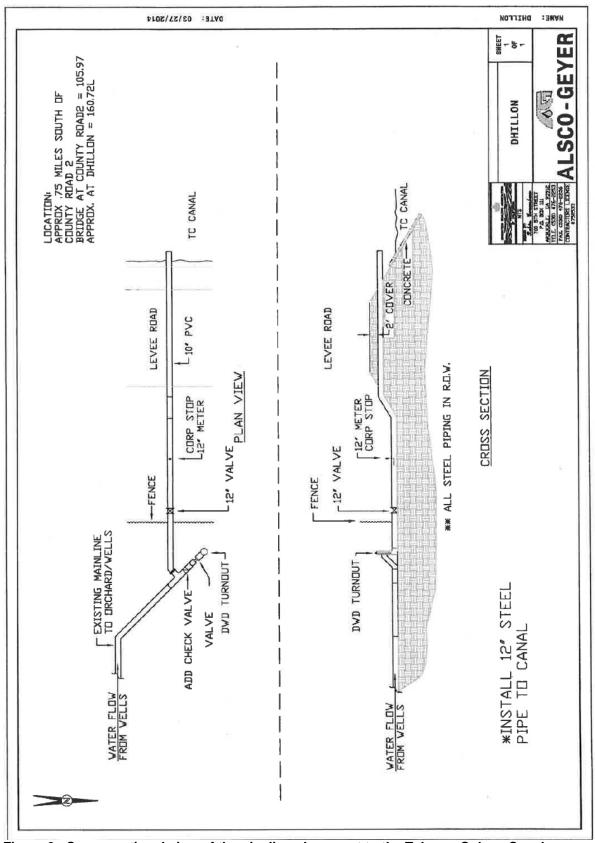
Cross sectional view of the pipeline placement to the Tehama-Colusa Canal.
